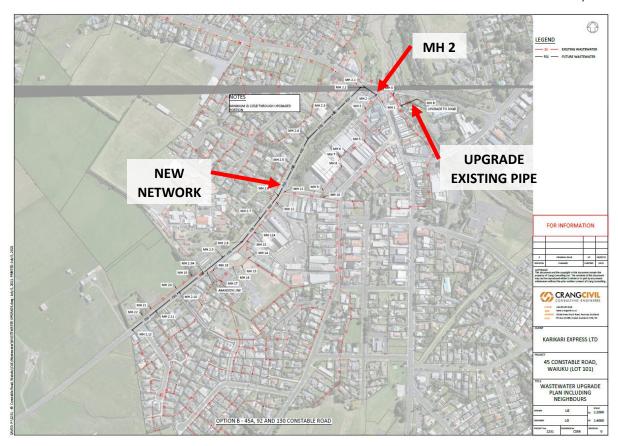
Option B - Wastewater Upgrade Plan for Lot 101, 92 and 130 Constable Road, Waiuku
